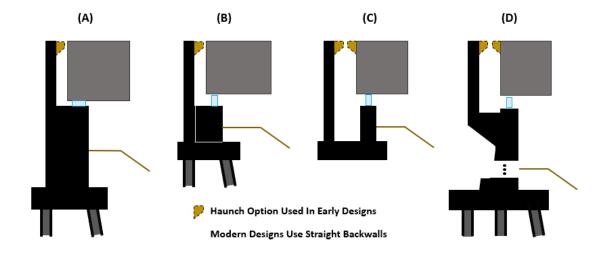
Conceptual illustration of alternative seat-abutment designs used in California box-girder bridges: A) stem wall support, B) pedestal support, C) free wall support and D) cantilever. (Roblee, 2020*e*)
